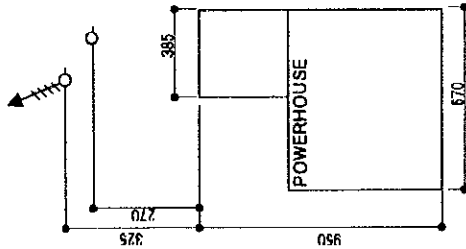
Layout Drawing of Barunbayan-Ulaan
